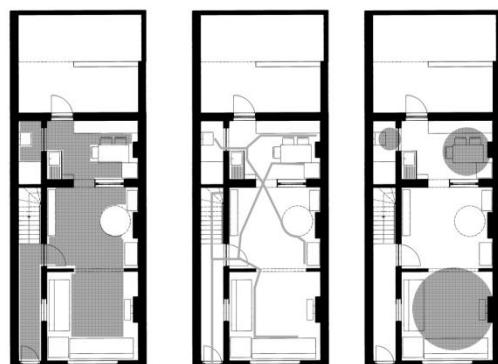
plan 1: inverted space| plan 2: run lines | plan 3 fields rest place
